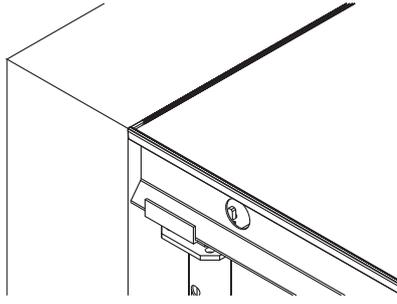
Prop - shoring head with the head cover located in the wall corner
